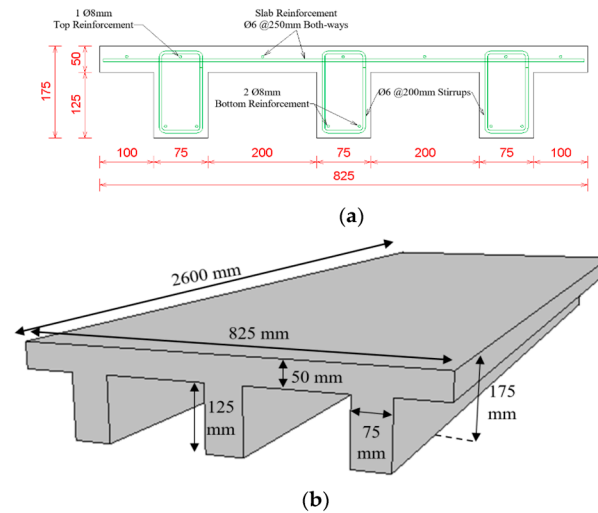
Details of ribbed slab (dimensions are in mm): (a) Concrete dimensions and steel reinforcement in ribs and top slab; (b) Isometric view showing concrete dimensions [219].
